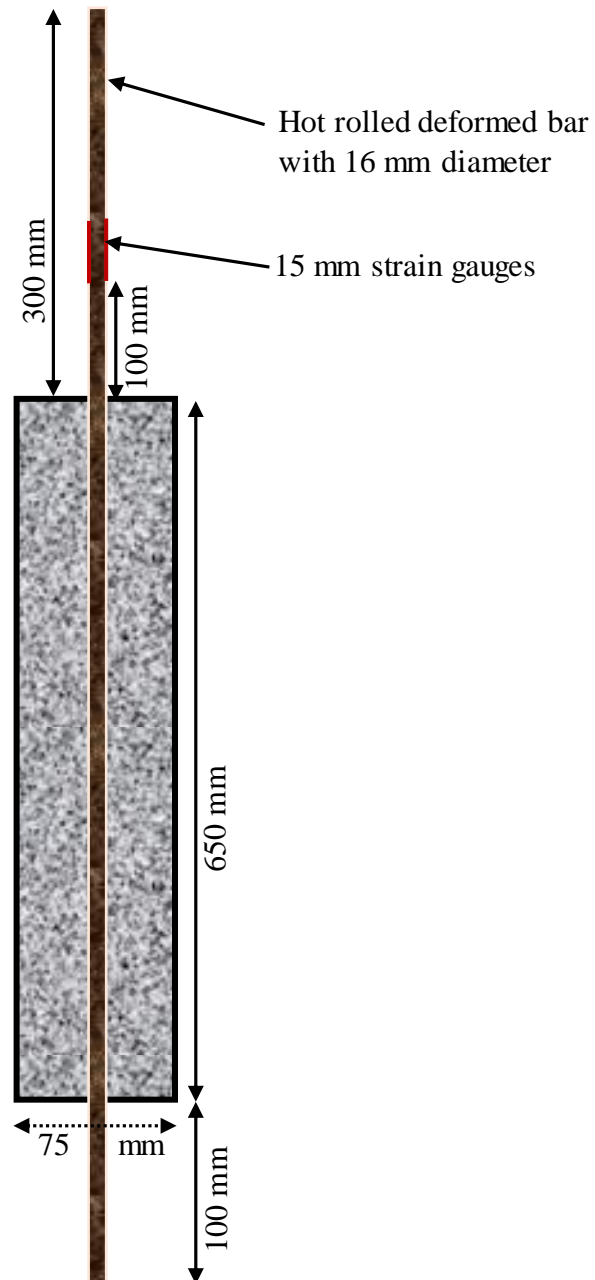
Specimen preparation for direct tensile strength test of reinforced concrete specimen.
